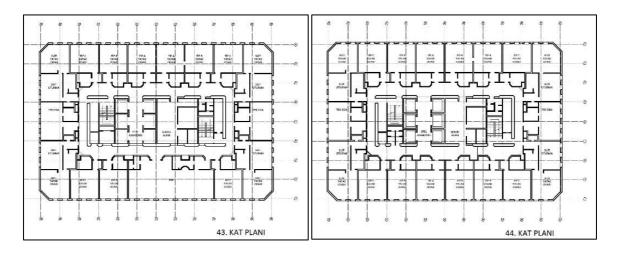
Forty-third and forty-fourth floor plans of Mersin Metropol Building
